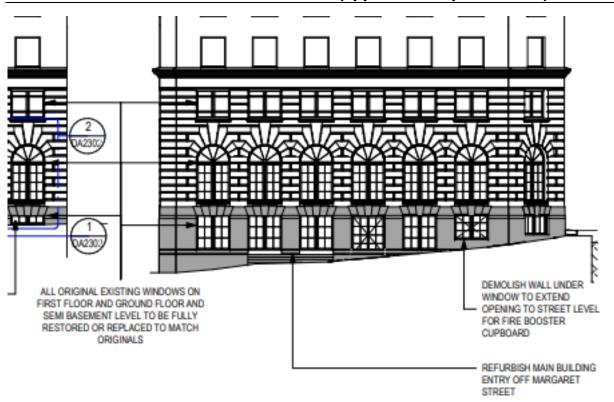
Proposed Shell House Elevation—extract showing changes to the Margaret Street (North) Elevation as approved in the 2016 s.96 modification. (Source: Make + Architectus, DA2300, Proposed Shell House Elevations, Rev06, 27 October 2017)
